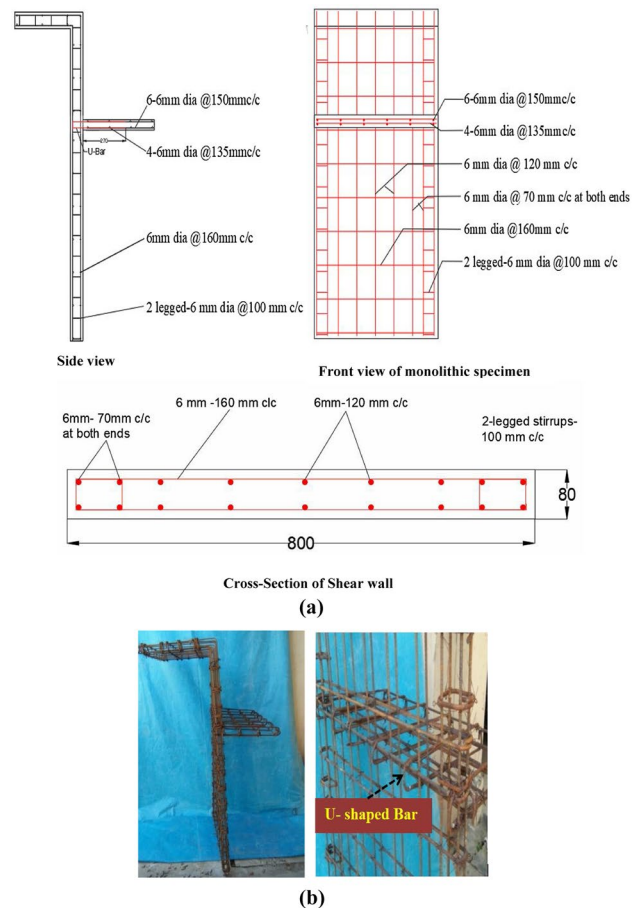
a Reinforcement details of monolithic connection. b Bar bending
